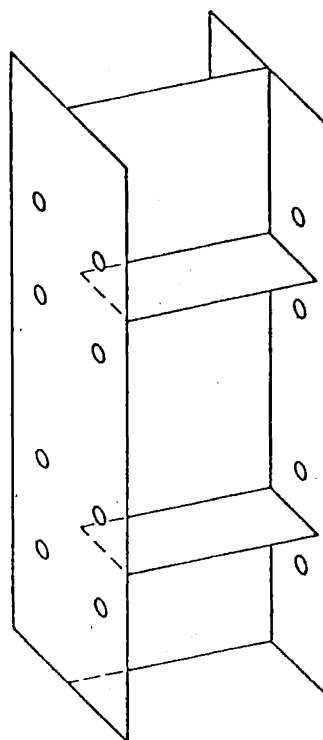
Horizontal column flange stiffeners welded to the flanges and web.
